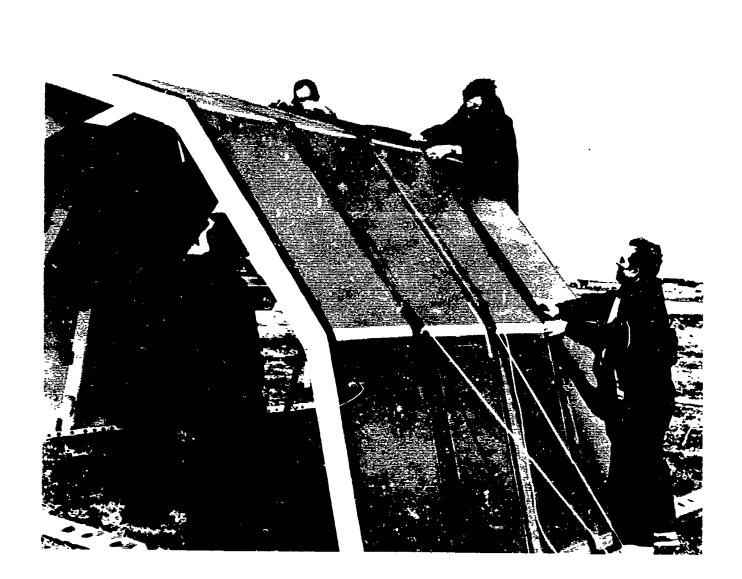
SHELTER #2 FIELD TEST, LANGLEY AFB (INSTALLATION OF FIRST ARCH ON GRADE BEAM)
